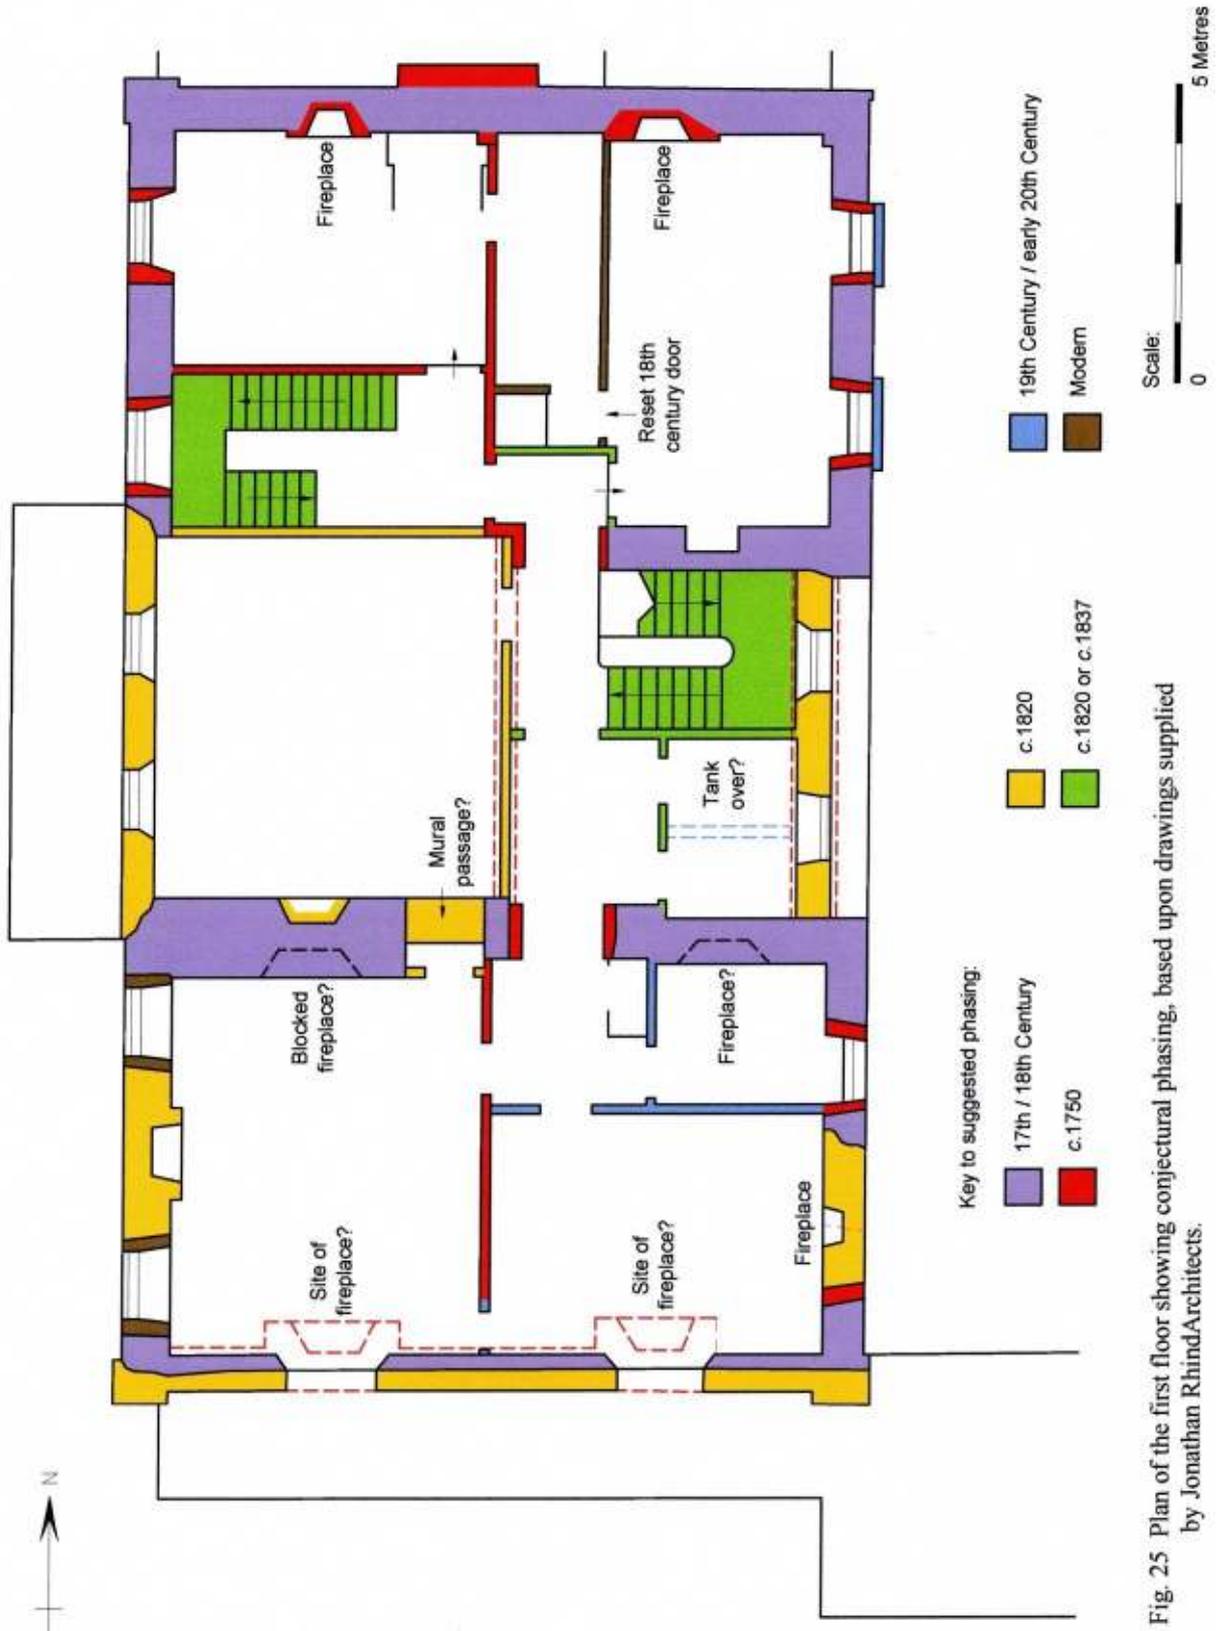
Plan of the first floor showing conjectural phasing, based upon drawings supplied by Jonathan RhindArchitects.
